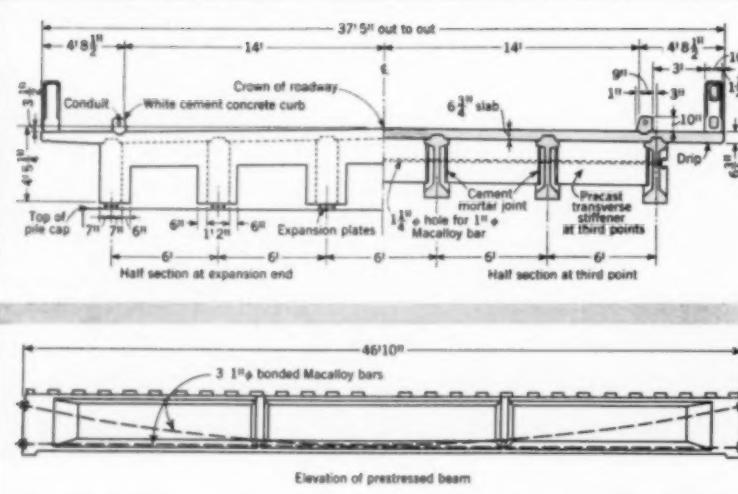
Prestressed beams 48 ft. long are used for about 3½ miles of concrete trestle in Lower Tampa Bay crossing.
